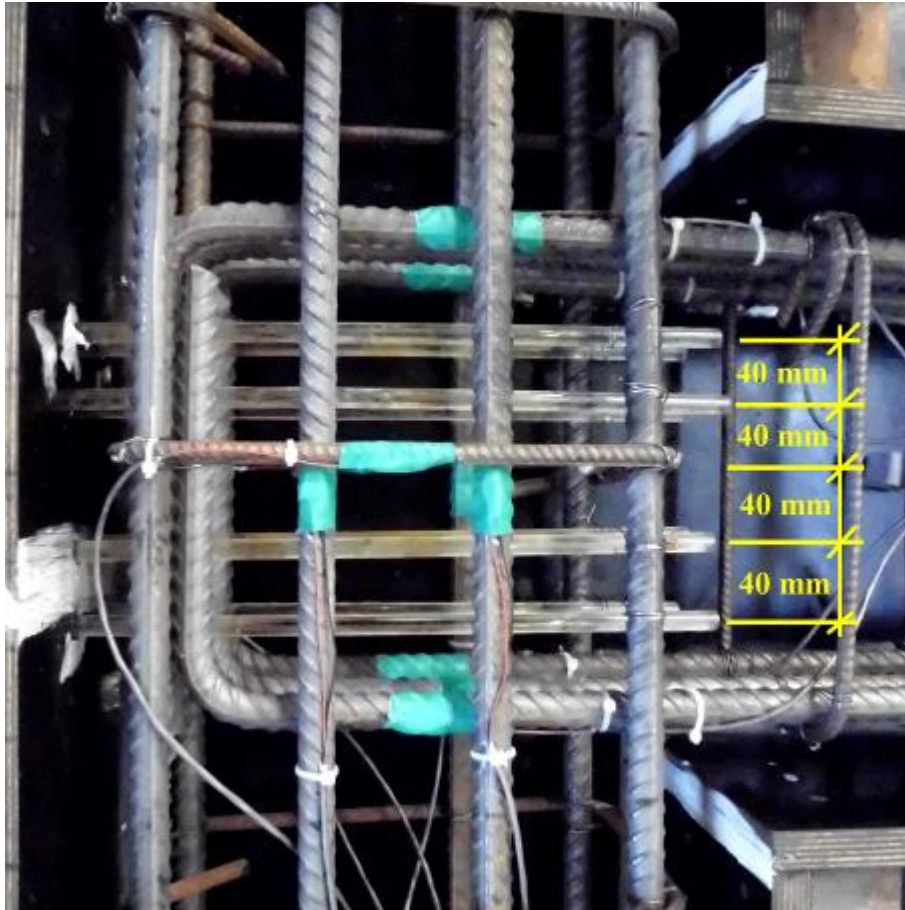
Reinforcement details of the test specimens, unit in mm.
